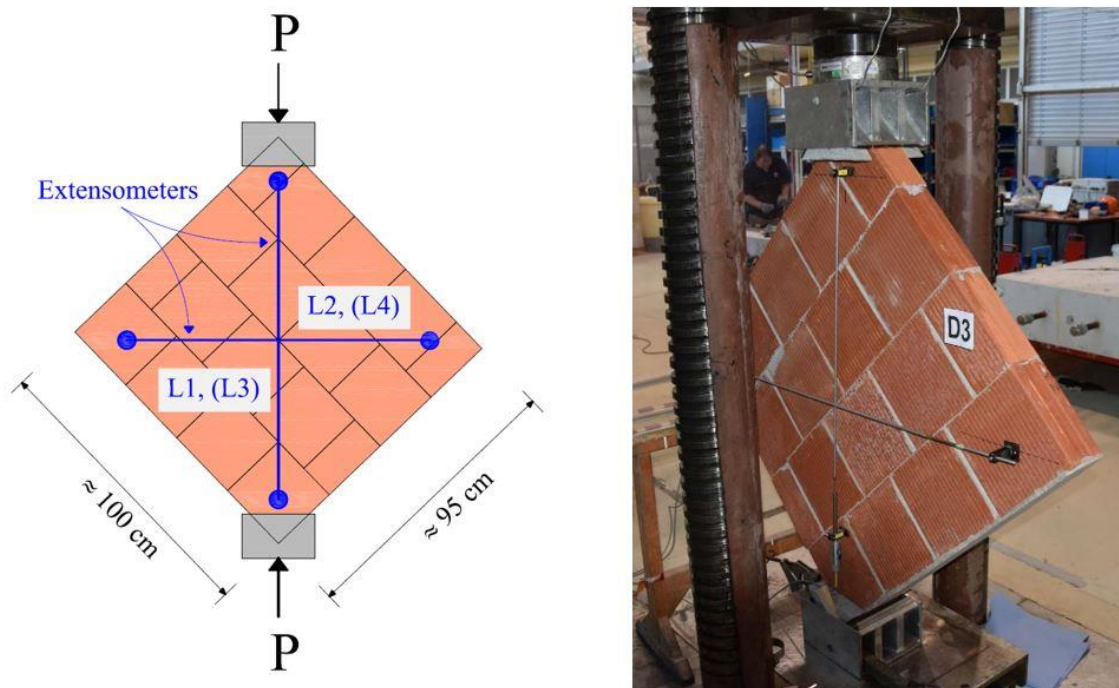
Details of the loading instrumentation (left) and test setup of the specimen WD3 (right).
